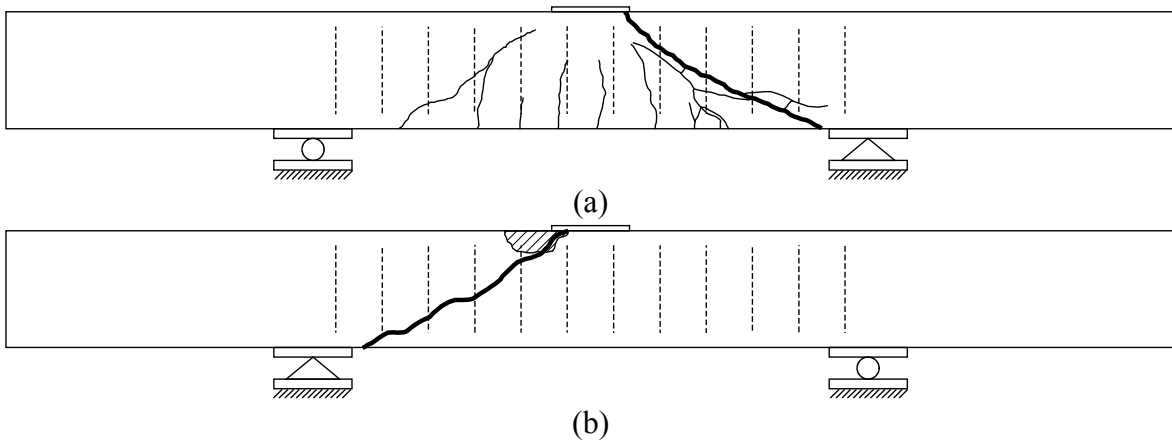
Observed damage in specimen P2S2, (a) front side, (b) back side
